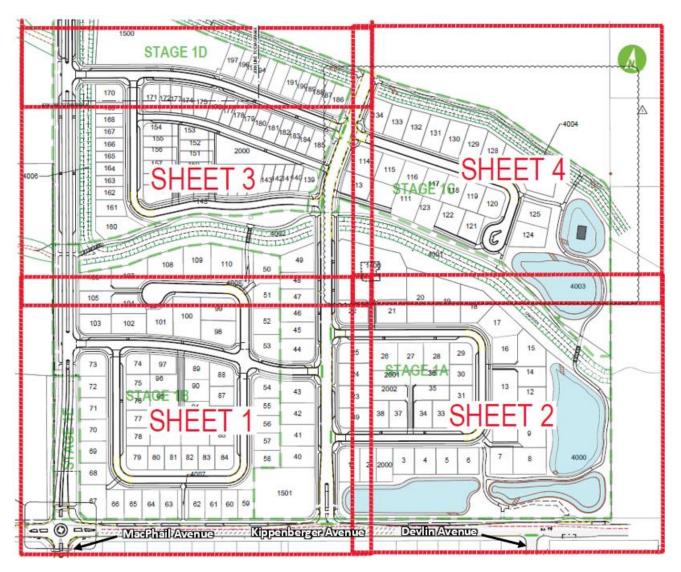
Bellgrove Subdivision Layout (Aurecon 'For Construction' Plan)
